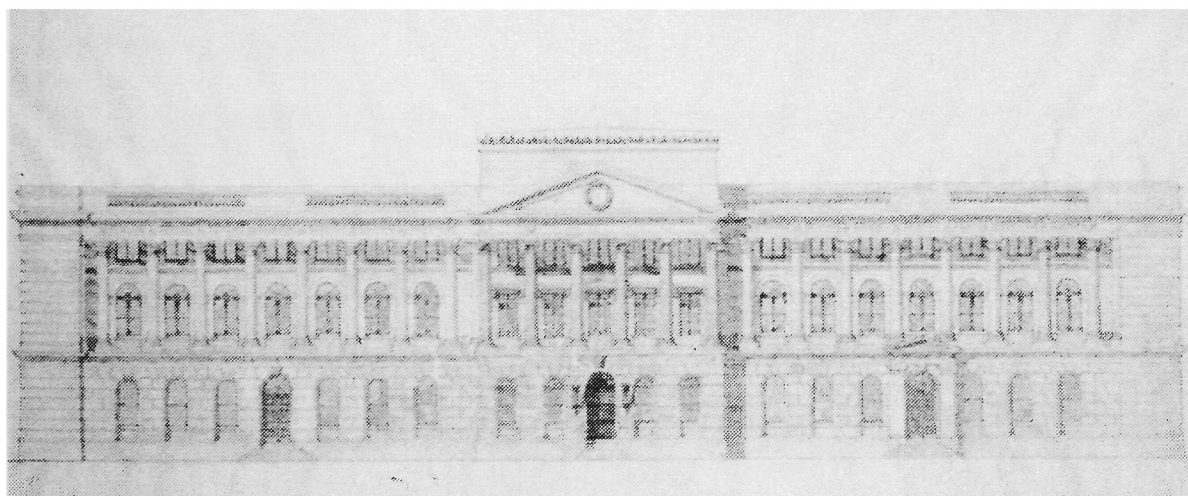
William Street elevation of proposed executive building 1933 (QSA PD93.5/1)
